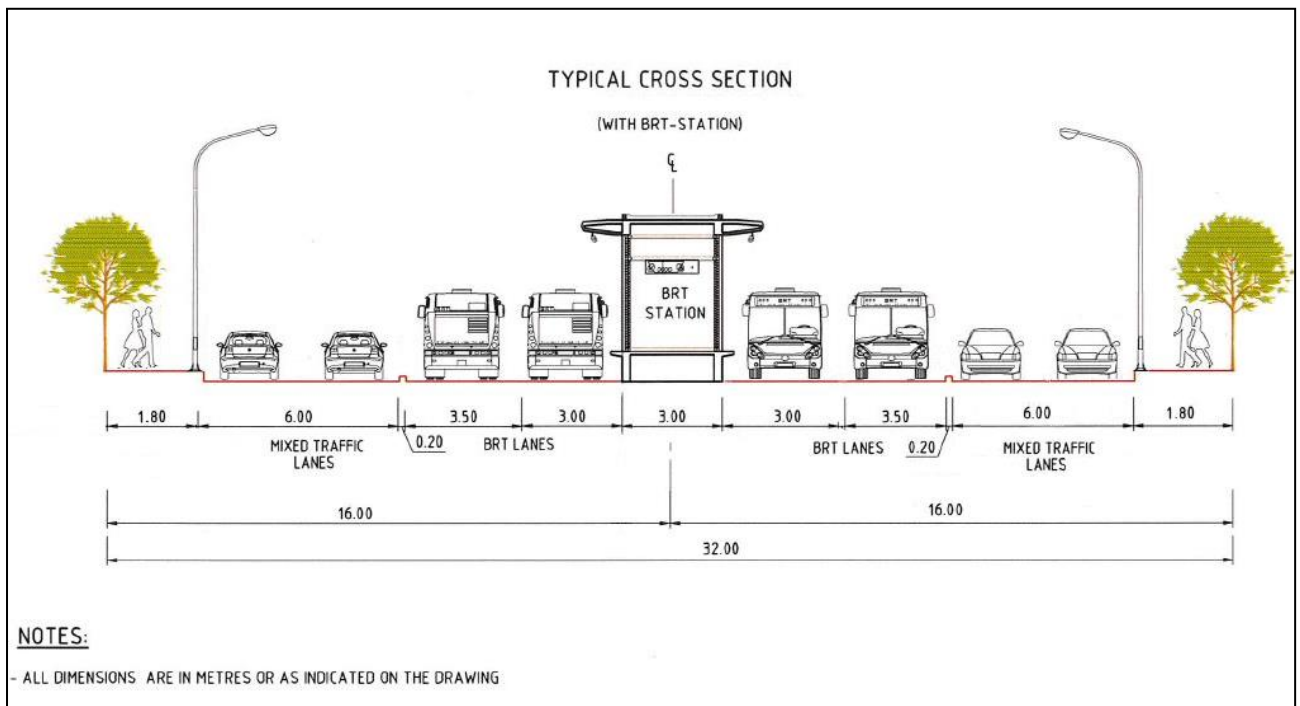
Proposed BRT Cross Section of Roadway to be implemented (with station)
